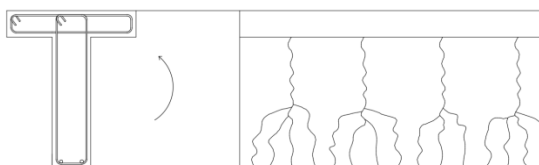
Propagation of cracks in a high beam without reinforcement area in the web.
